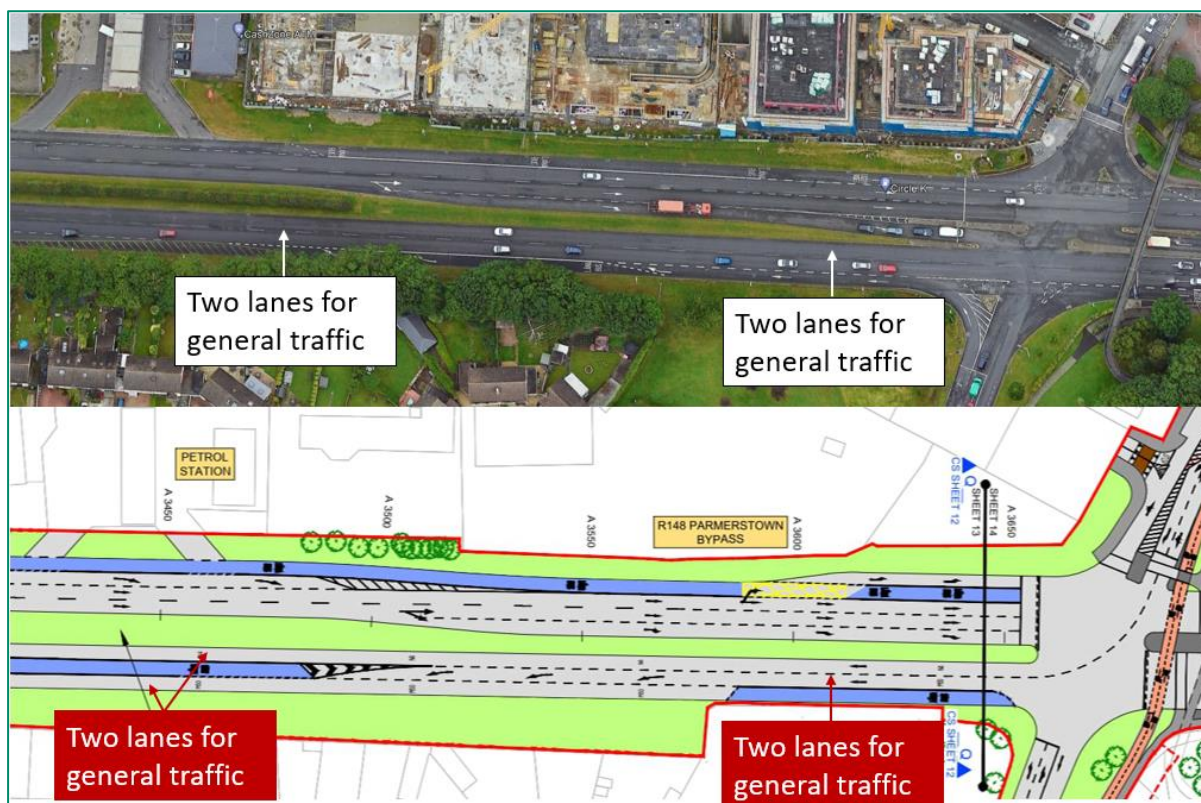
Extract of General Arrangement Drawings showing the arrangement West of Kennelsfort Road Junction and aerial image of existing arrangement (Image Source: Google)
